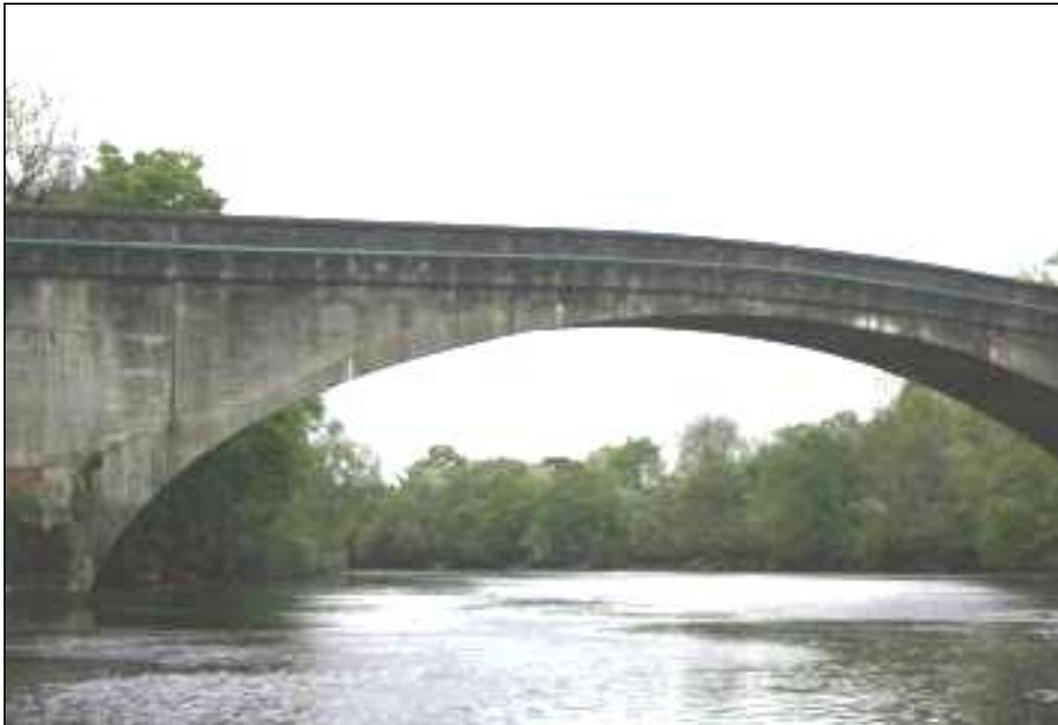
Tailrace Canal Crossing, Parteen Bridge
